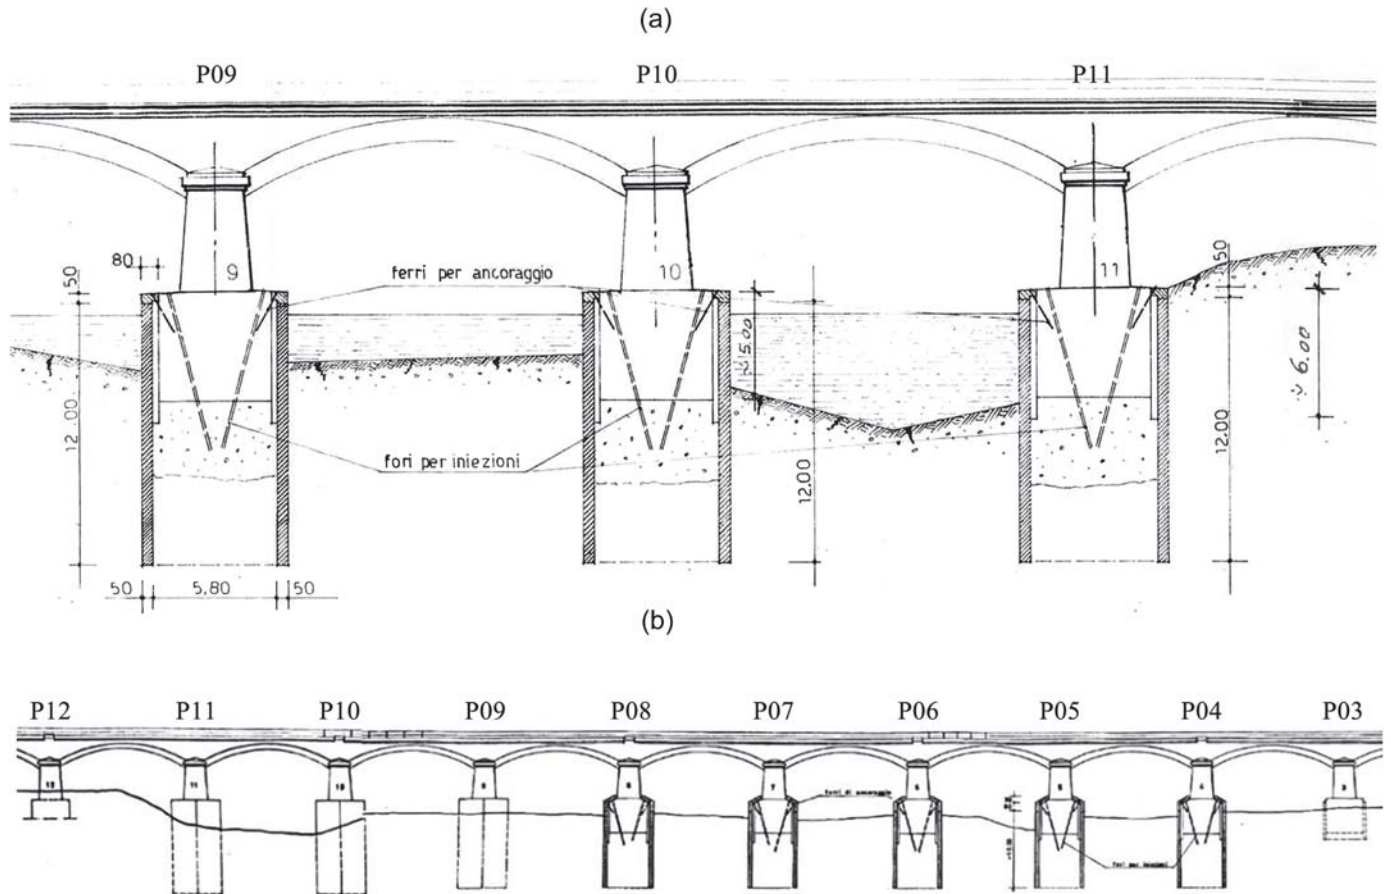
Historical drawings of different strengthening interventions on the piers: (a) 1955 intervention on piers P09, P10 and P11 (elevation from downstream); (b) 1984 intervention on piers from P04 to P08 (elevation from upstream).
